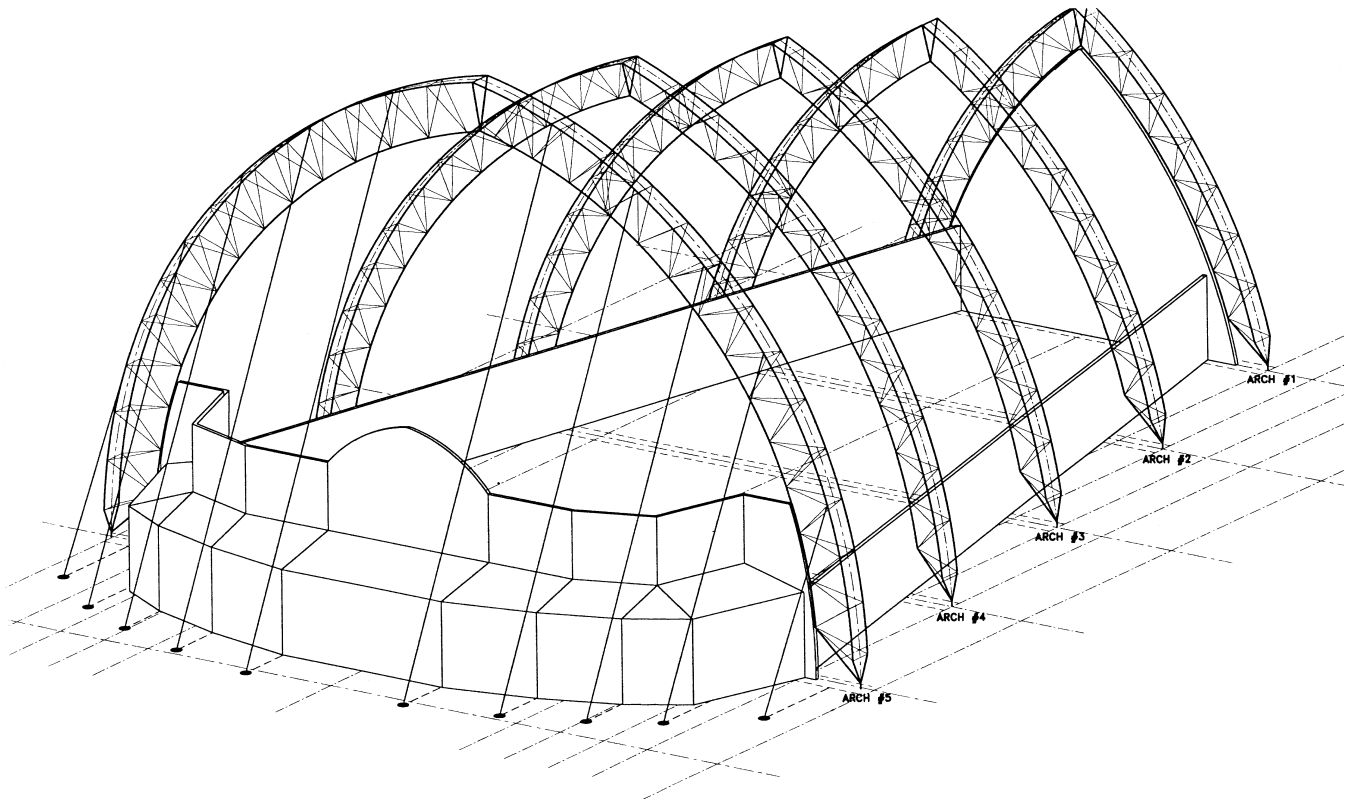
Perspective showing location of perimeter glazed wall.
